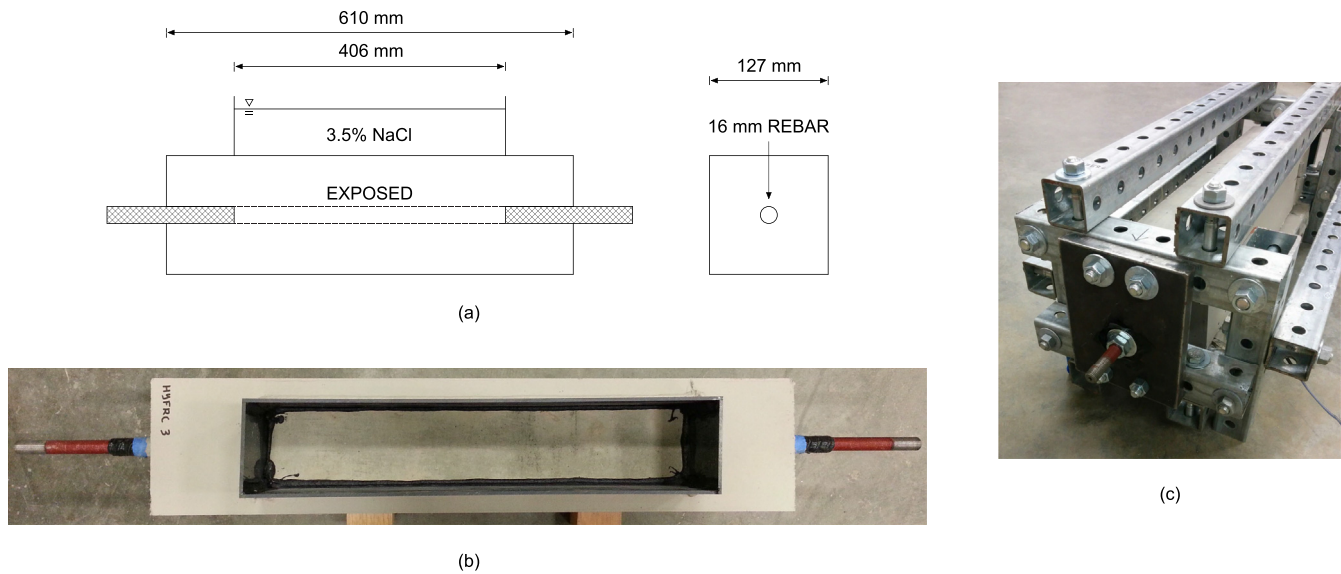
Details of specimen design: (a) Geometric drawing; (b) Plan view of specimen with ponding dam fixed to concrete surface; (c) Specimen in loading frame.
